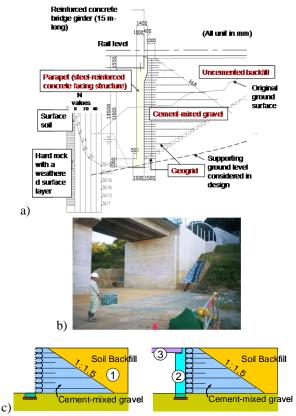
A bridge abutment at Takada, Kyushu, for a new bullet train line (Tatsuoka et al., 2005); a) structural details;b) lateral and vertical loading tests of the facing; and c) staged construction .
